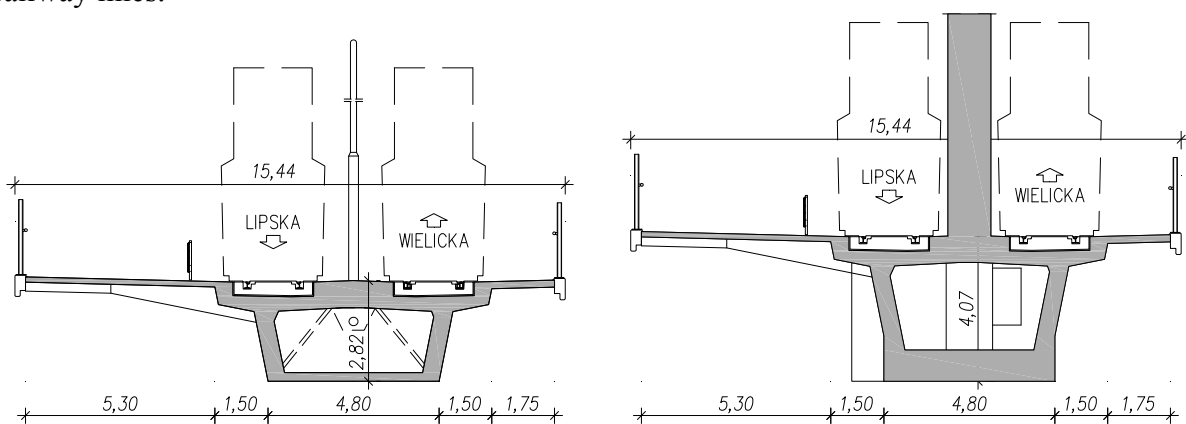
Cross-section of the main bridge in span section and above the pylon
